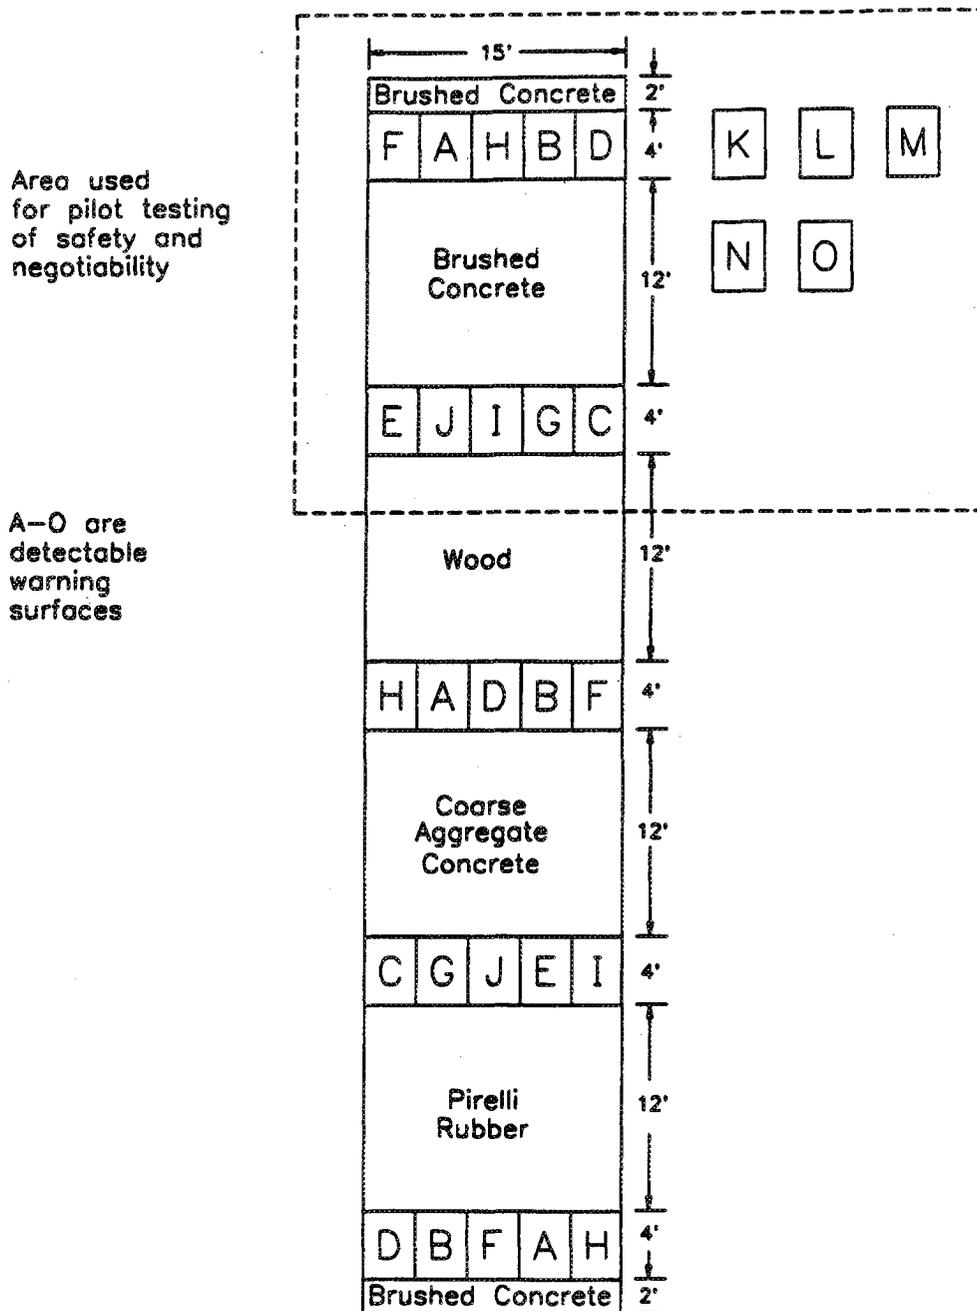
Laboratory platform for testing detectability of ten detectable warning surfaces when approached from four platform surfaces. Figure shows portion of platform and adjoining level floor used for pilot testing of safety and negotiability. Constructed at old Broadway Station, MBTA.
